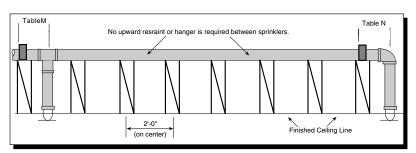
Fig. Q • Sprinkler Drop Pipe Adjacent to Truss
